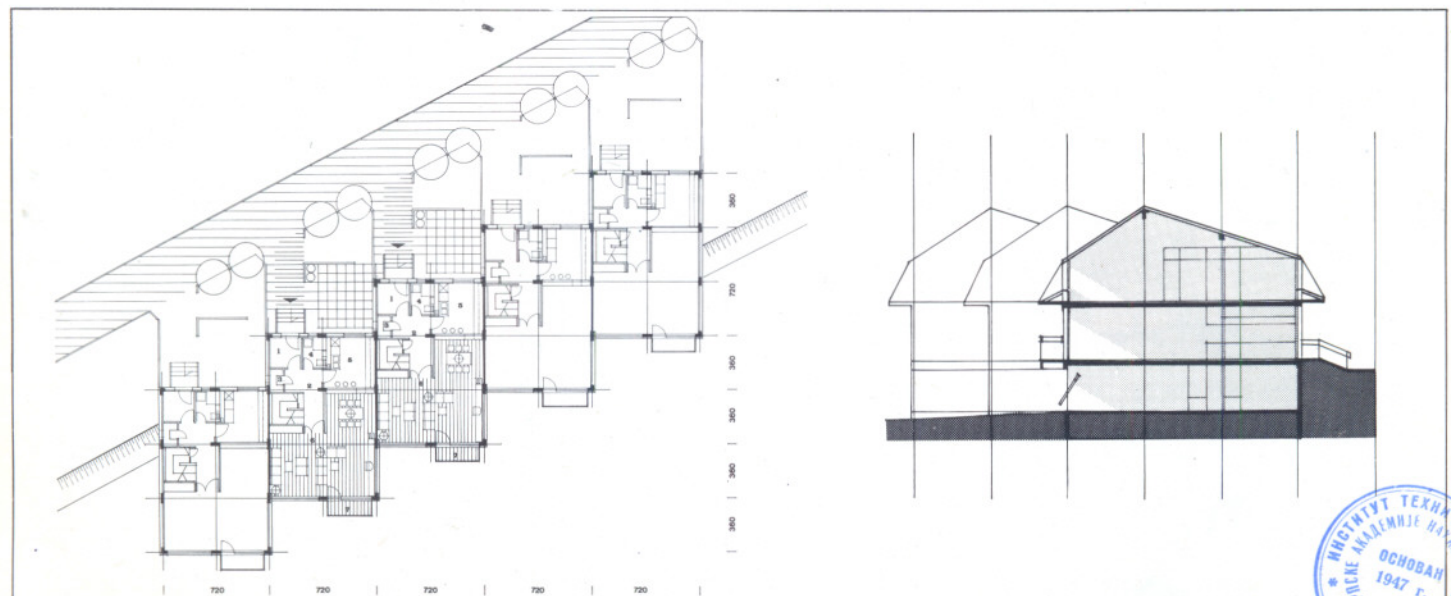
Floor plan and section of single family attached dwellings, two stories high with cellar in Smederevska Palanka
